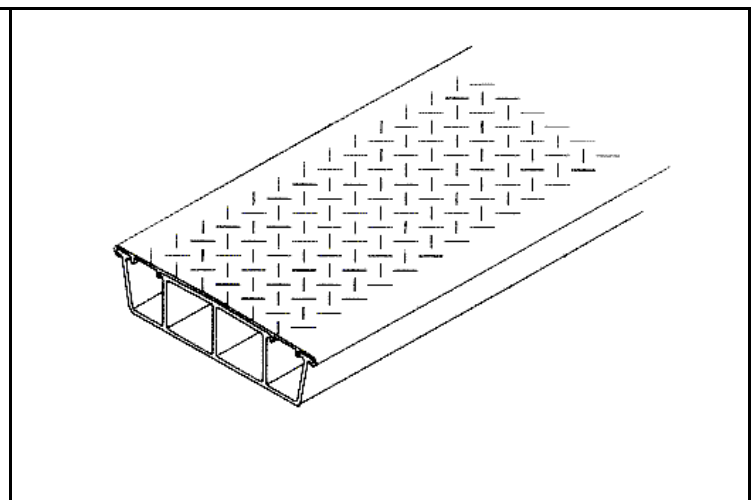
ASSEMBLED TECK DECK FLOORING
